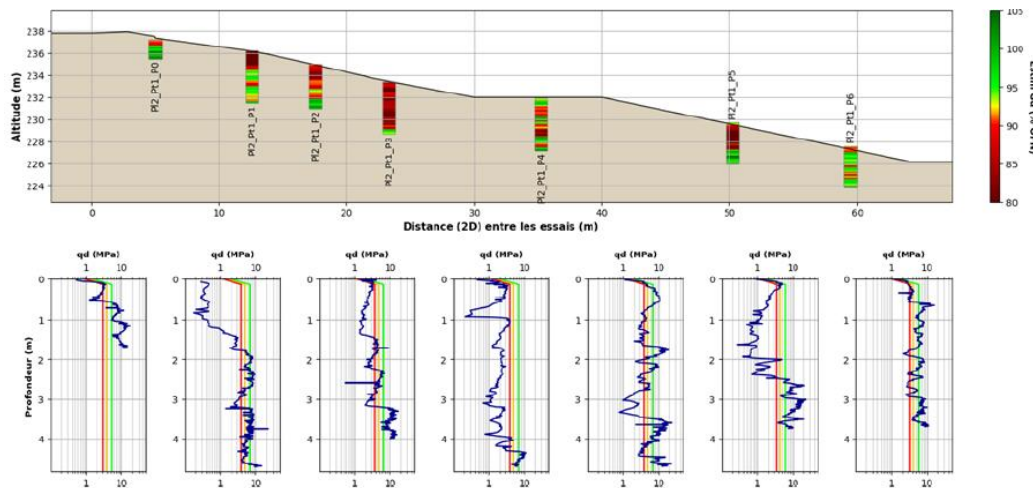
Tailing storage Facilities Slope compaction control through Panda test (cf. Benz et al. 2024)
